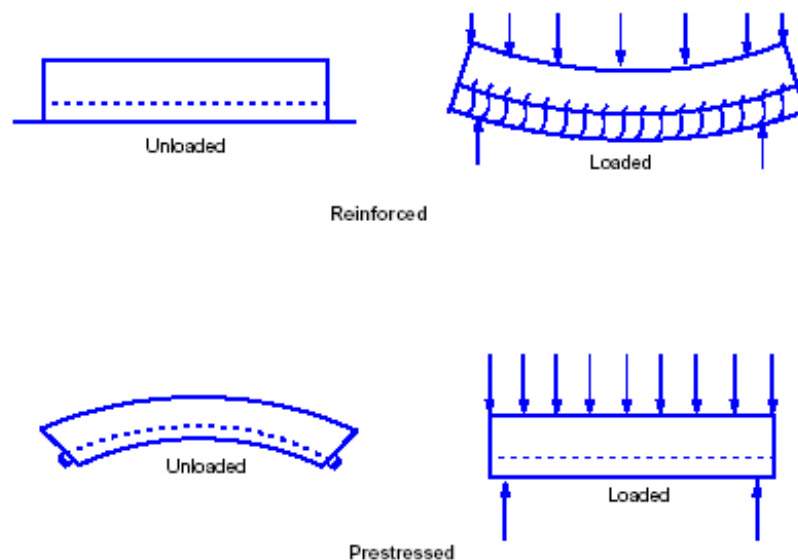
Difference between reinforced and prestressed concrete beam (Ash, 2022)
